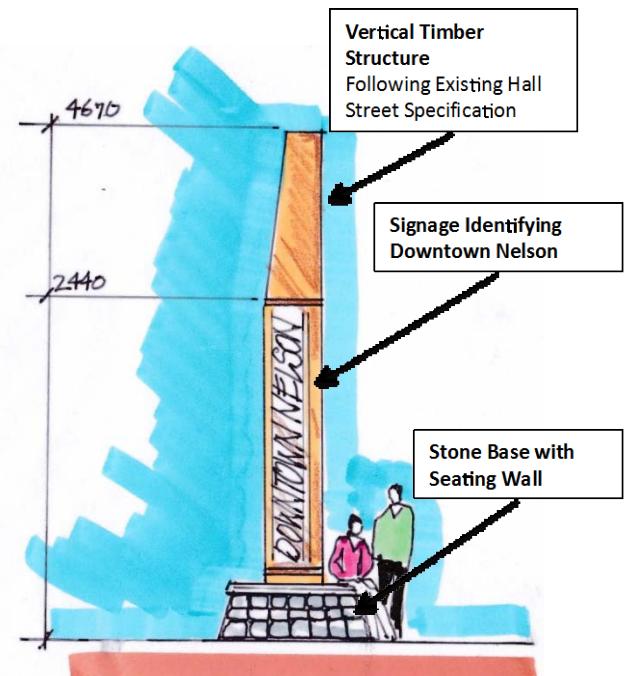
Primary north gateway sign at the intersection of Vernon and Ward Streets
